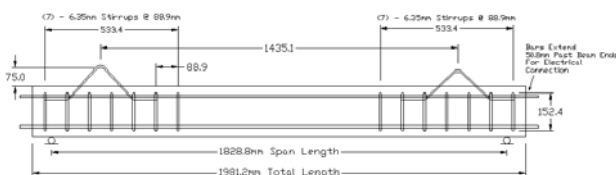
Beam specimen (profile dimensions) to show reinforcement layout (all dimensions in mm)
